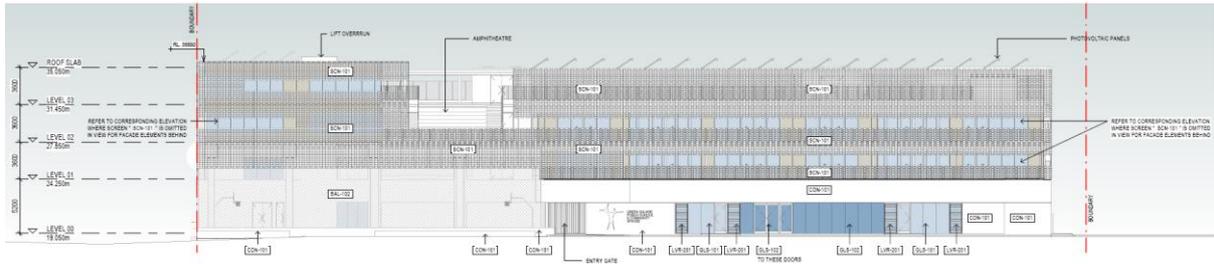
| West Elevation with Flexi-Brick screen (Source: BVN)
